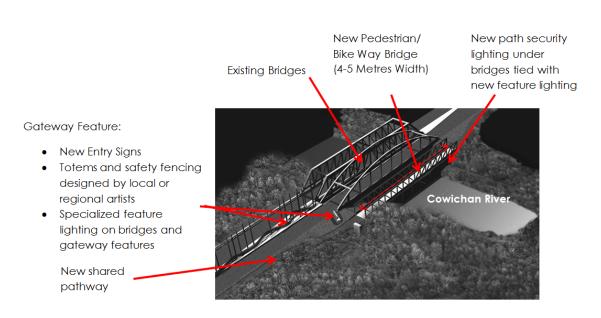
Cowichan River Trail Bridge and Gateway Concept
